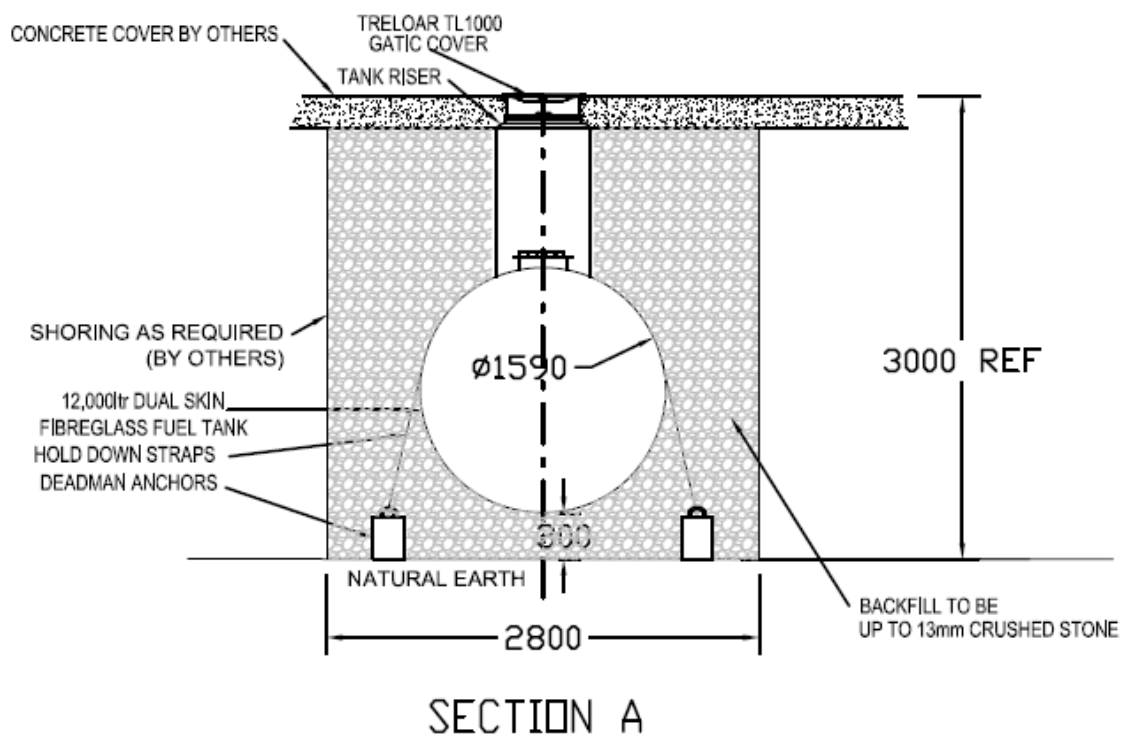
Example of a section showing tank depth, backfill and concrete cover.
